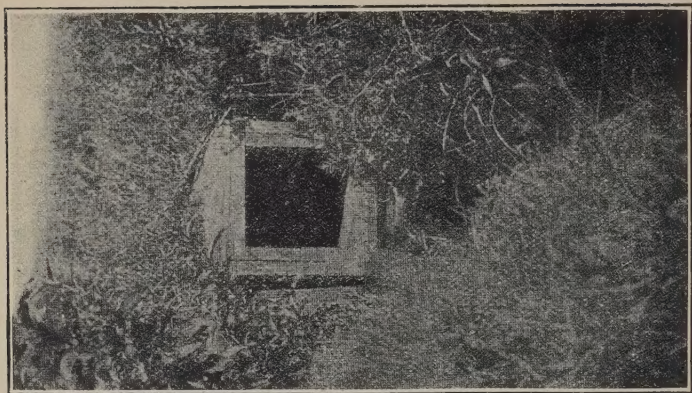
A road culvert placed at too high an elevation to drain completely—a "man-made" mosquito producing area.
